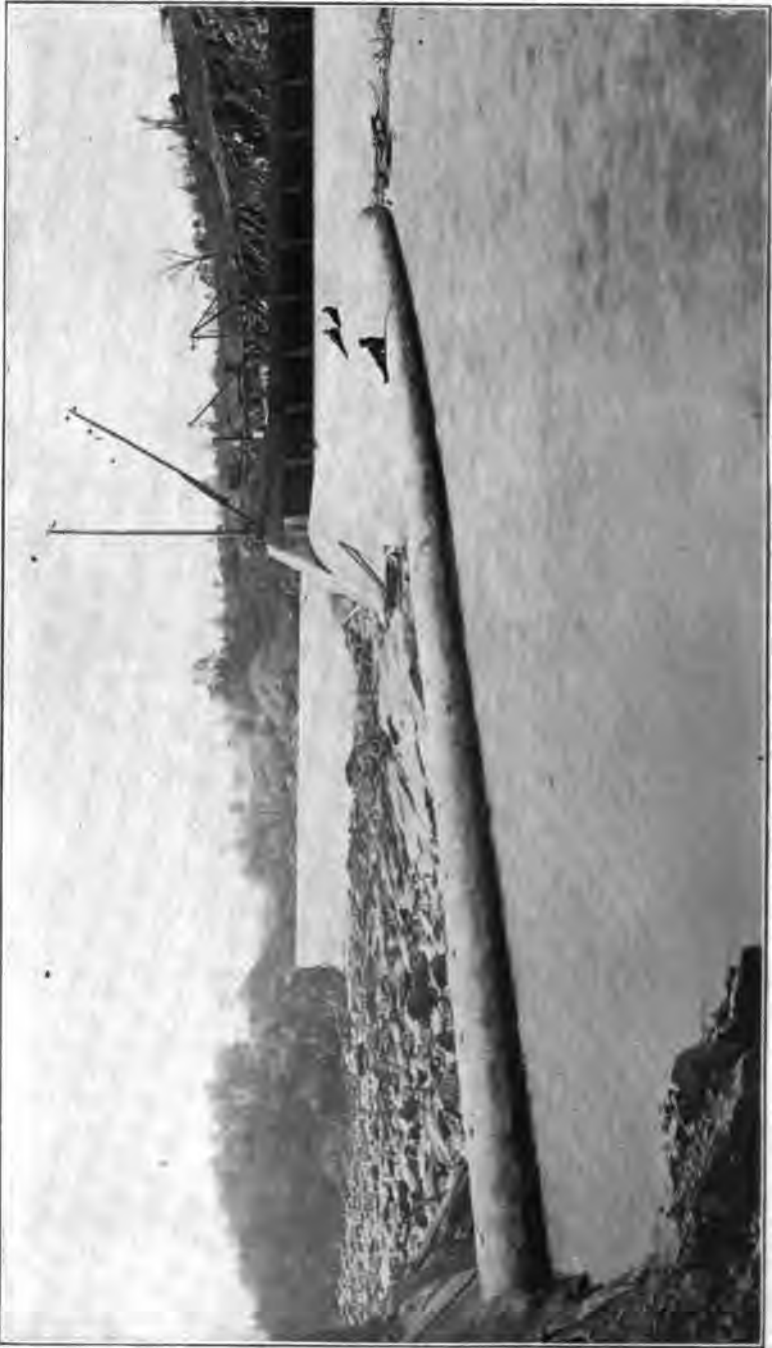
Great Falls dam, showing racks, head gates and method used to obtain long spillway
